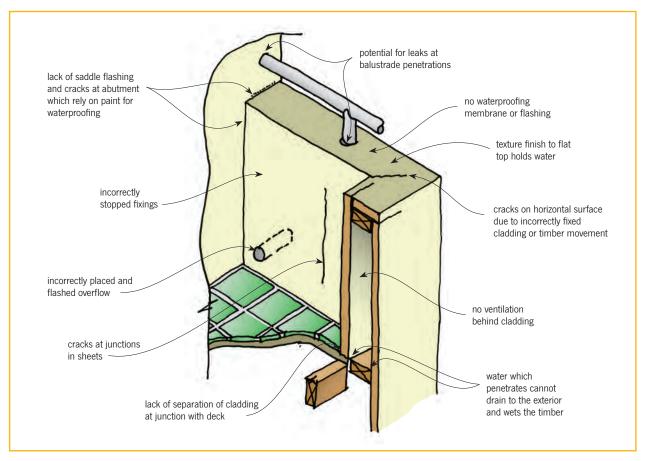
Deck balustrade showing factors that can cause problems in enclosed structures.
